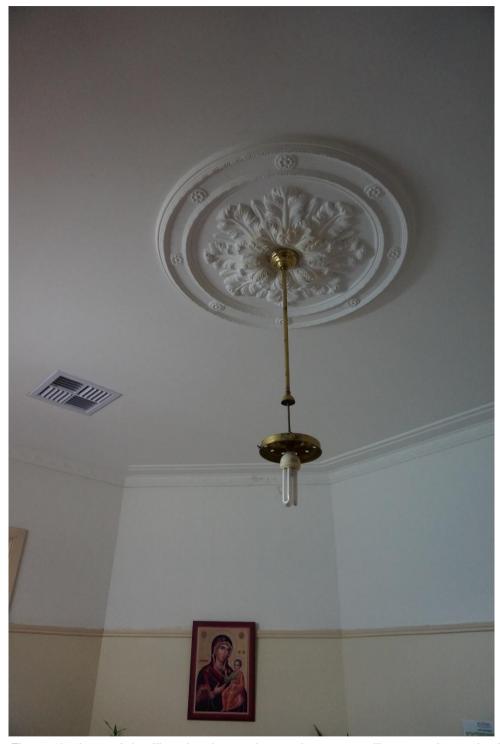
Internal detailing showing modern replacement ceilings, cornice and ceiling rose detailing which has been carried out throughout the building.
